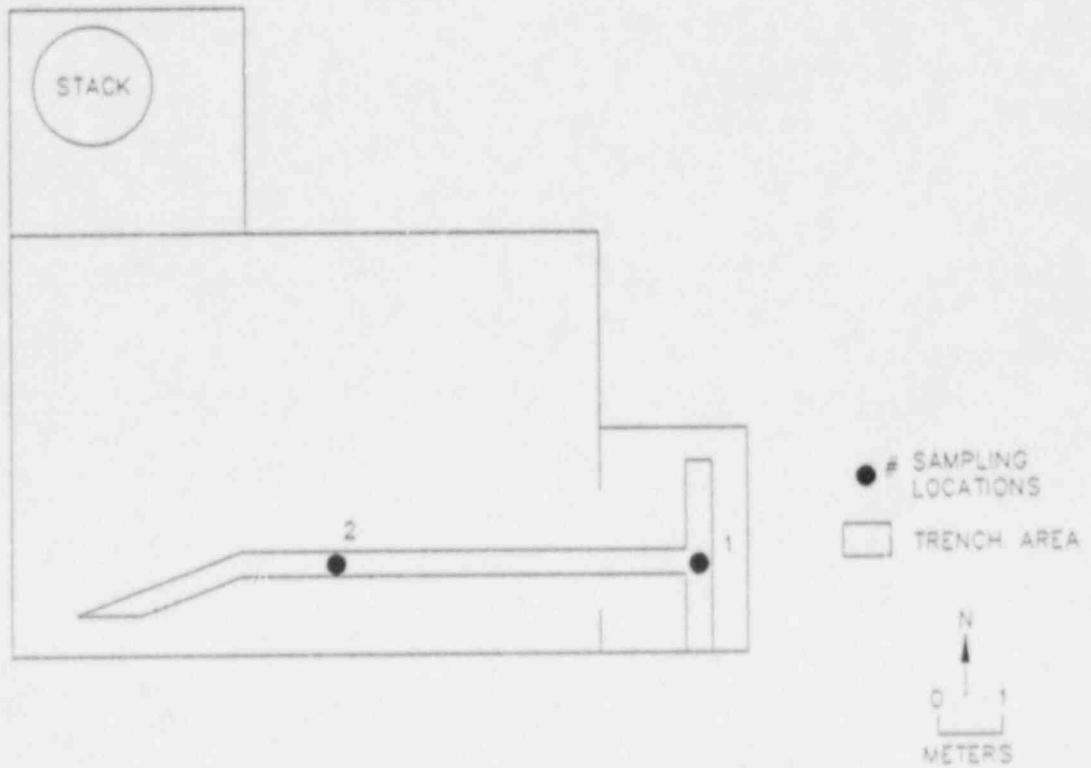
Laundry Room Showing Trench Soil Sampling Locations
